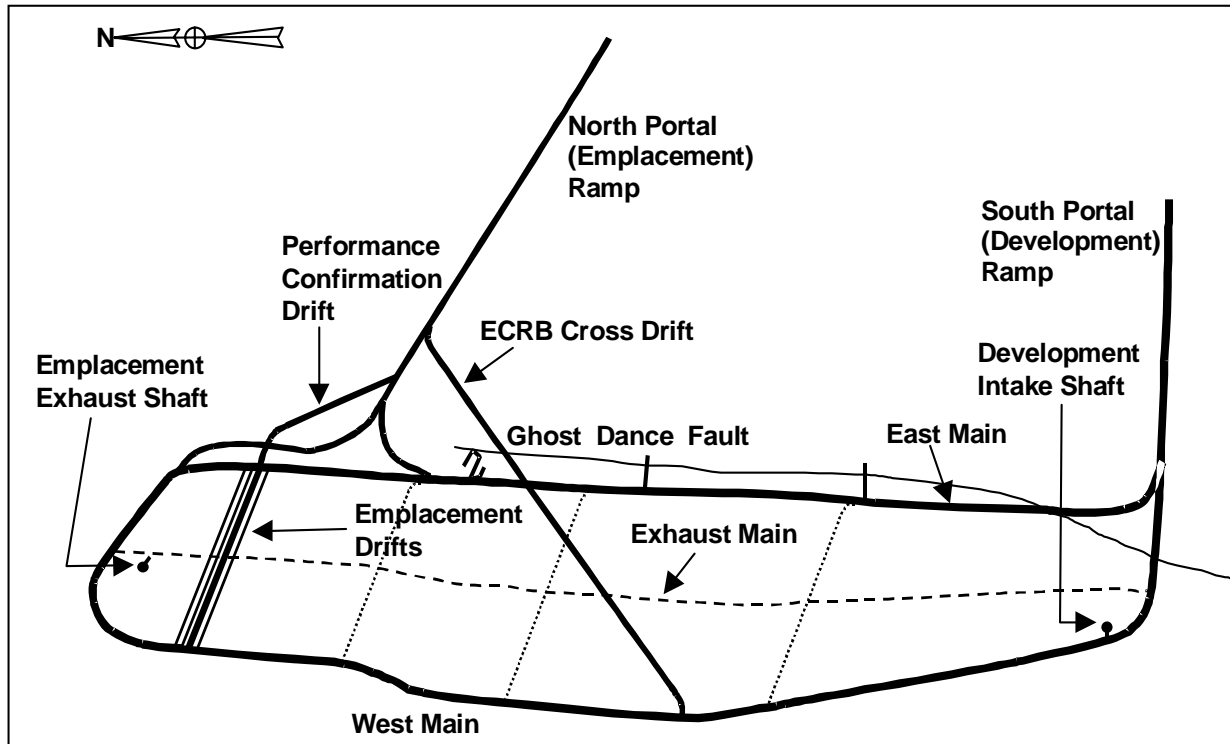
Conceptual Subsurface Facility Layout of the Repository
